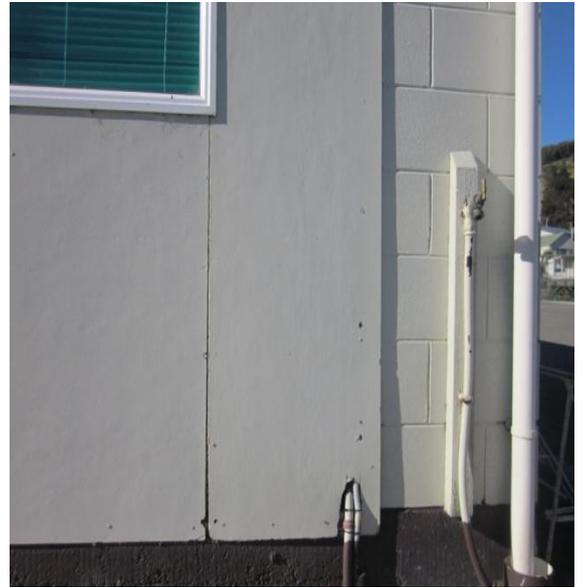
Separation between the external wall lining panels in the south west corner of the building
